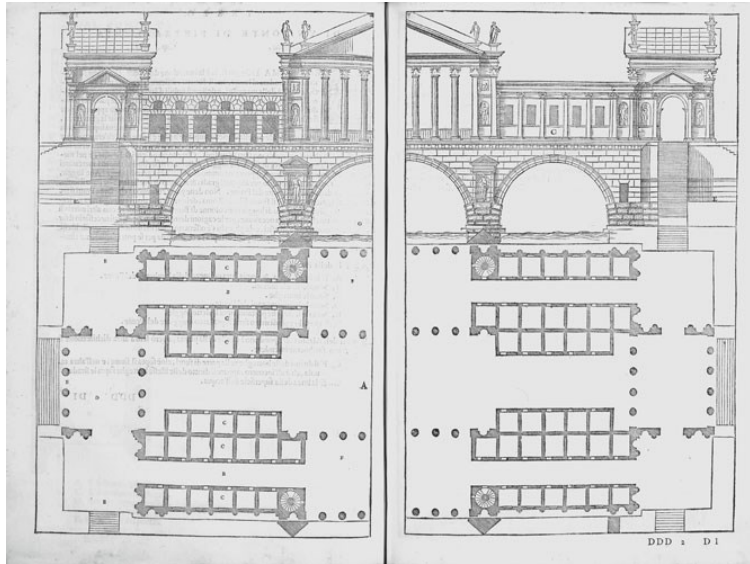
Andrea Palladio, plans and elevations for Rialto Bridge
